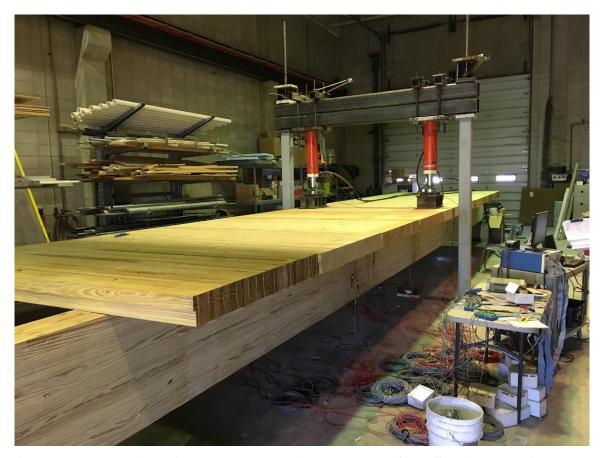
Installation of glulam deck sections on Large-Scale Specimen 2 using epoxy
